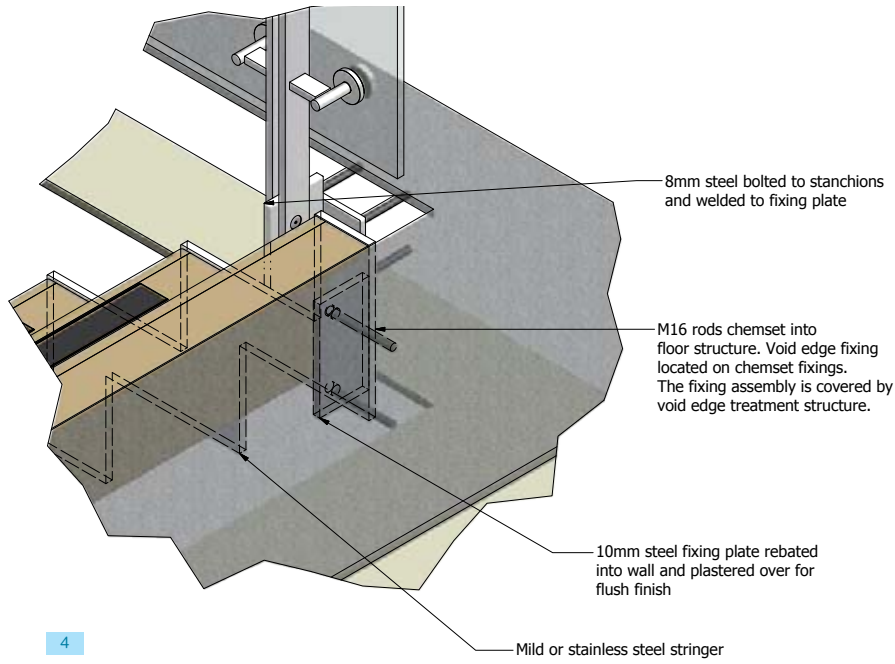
Typical top floor fixing detail. Fixing plates are welded to the inner side of each stringer and fixed to concrete floor. Fixing assembly concealed by top tread or bulkhead.
